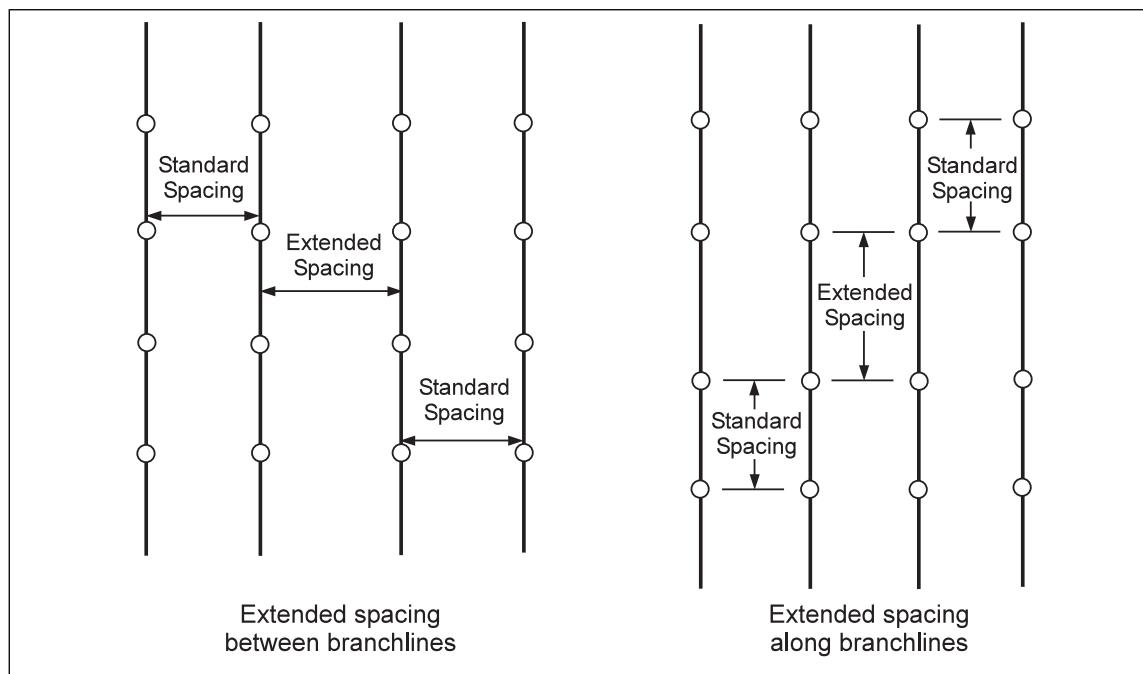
Allowable extension of maximum ceiling sprinkler spacing to avoid obstruction to sprinkler discharge
